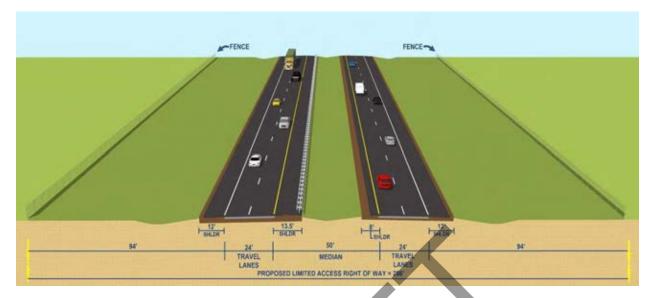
Typical Section – Alternative 2: New Alignment
